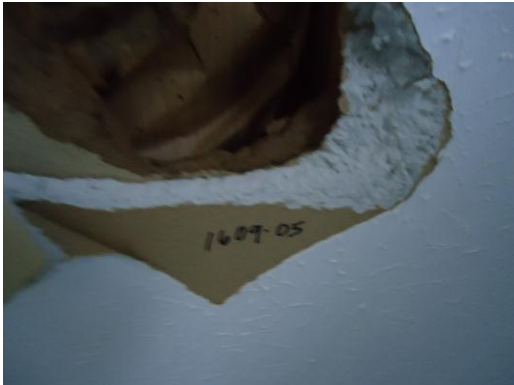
Drywall (1609-5) Room 1 West Wall. No Asbestos Detected.
